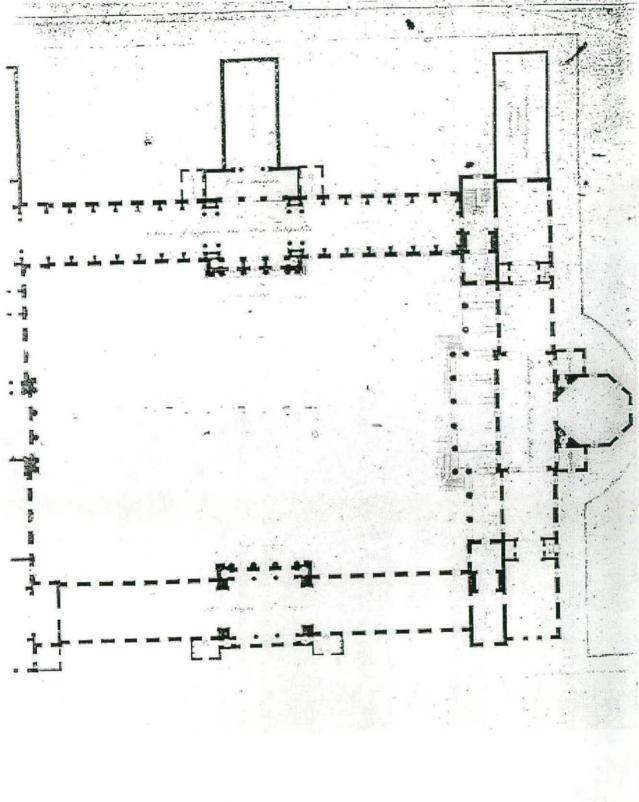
Robert Smirke, General Plan Proposed for the Buildings of the Museum - Upper Floor, 1836 (Plans vol I, f.72).
